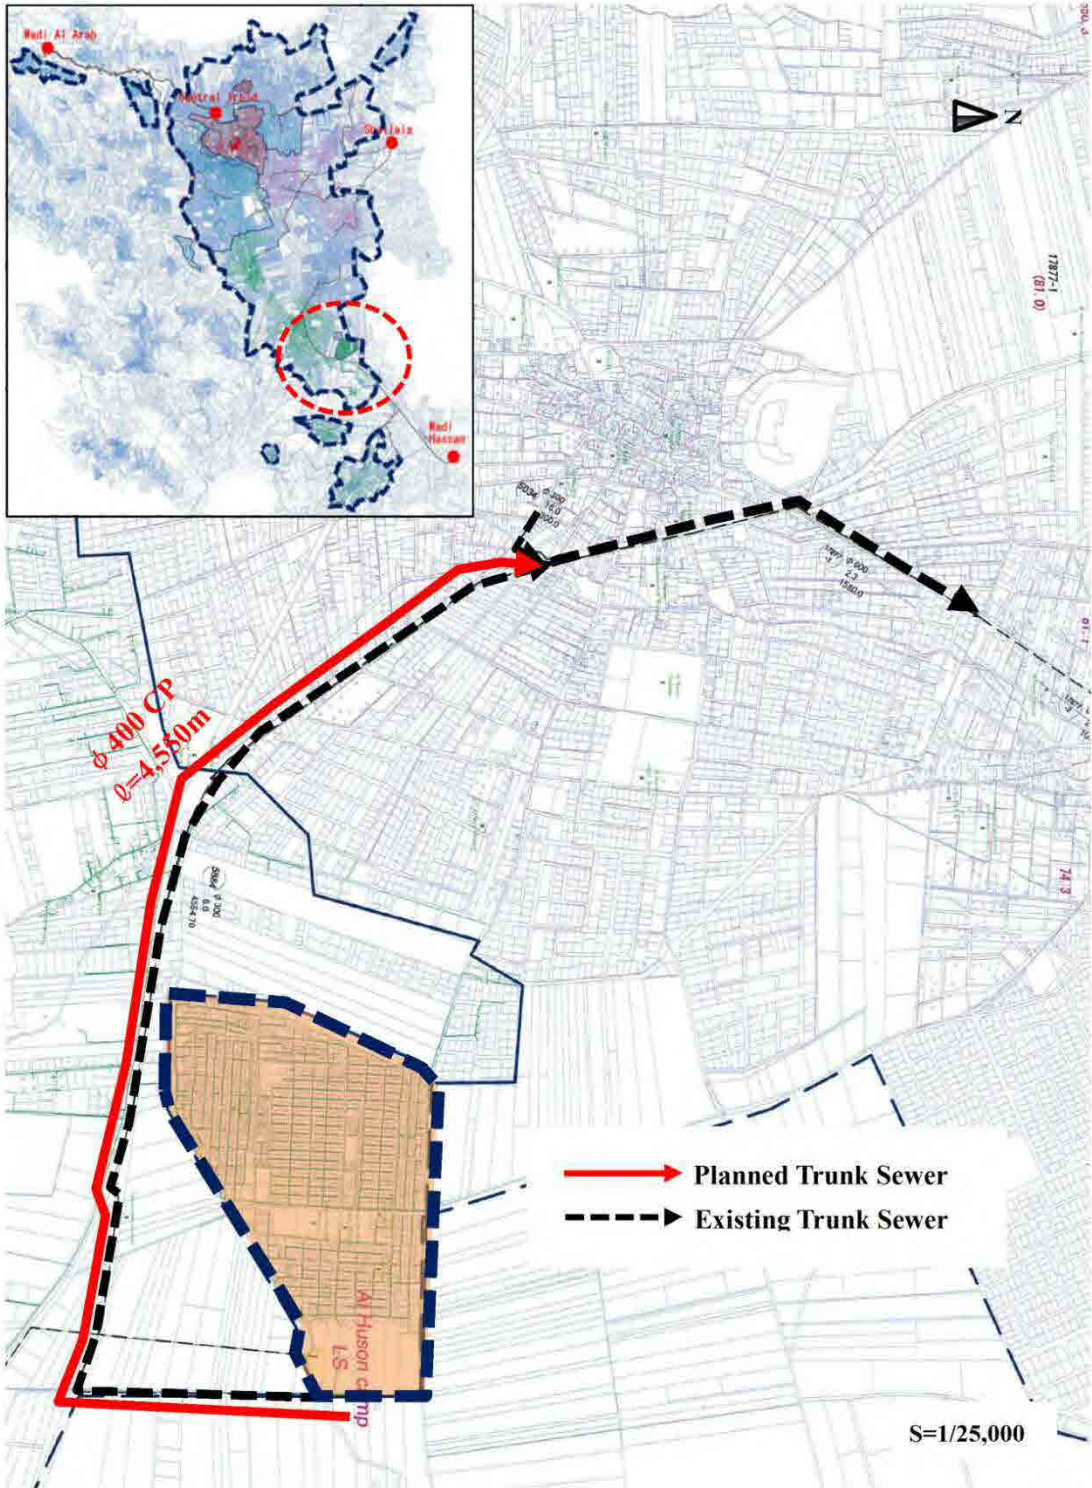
New Trunk Sewer in Shallala SWD (2)
